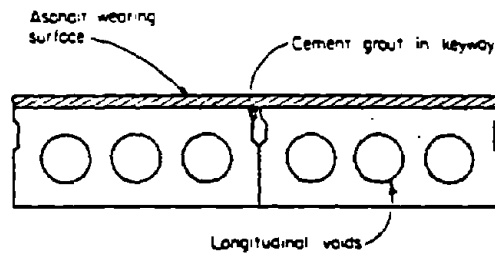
Voided Slab Section (Winter and Nilson 1979)
